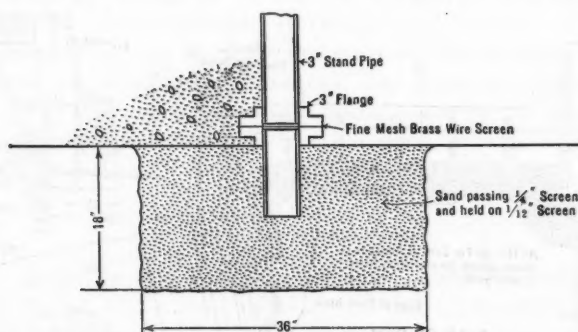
DETAILS OF PIPE WELL, COLORADO RIVER DAM.
